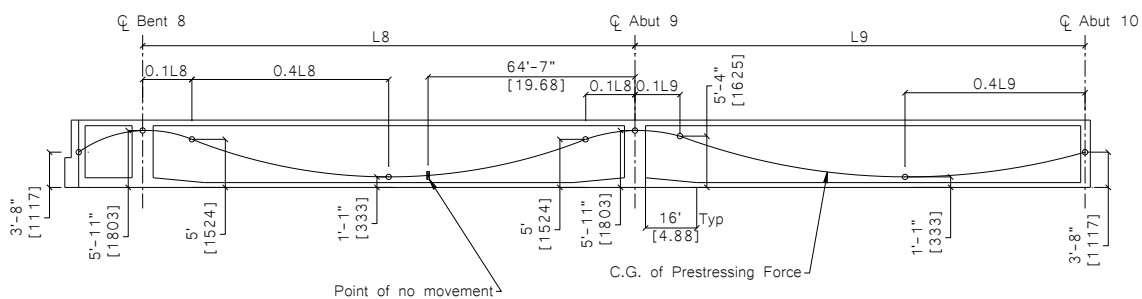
Prestressing tendons profile of Frame 5, Bridge 5WB
